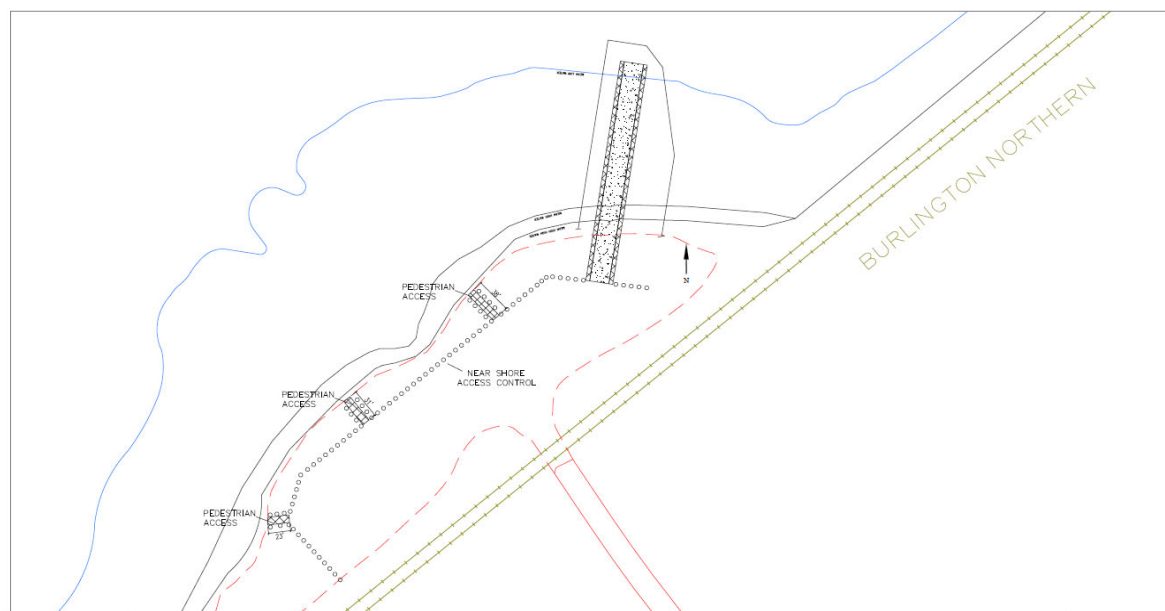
Plan view depicting the location of the proposed boat ramp and nearshore access control.
